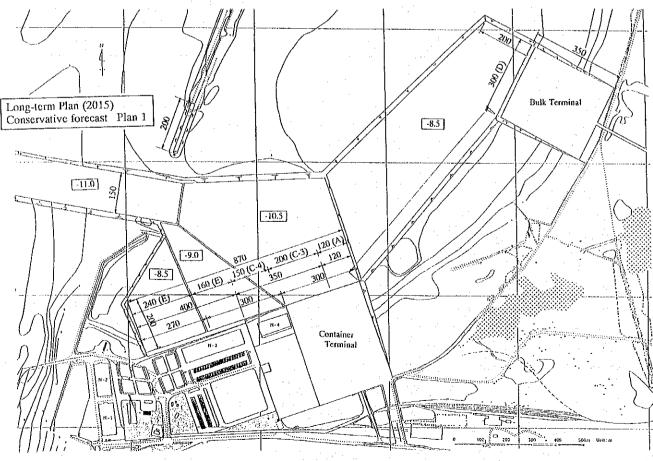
Location plan of quay structure by type, Case L-1
